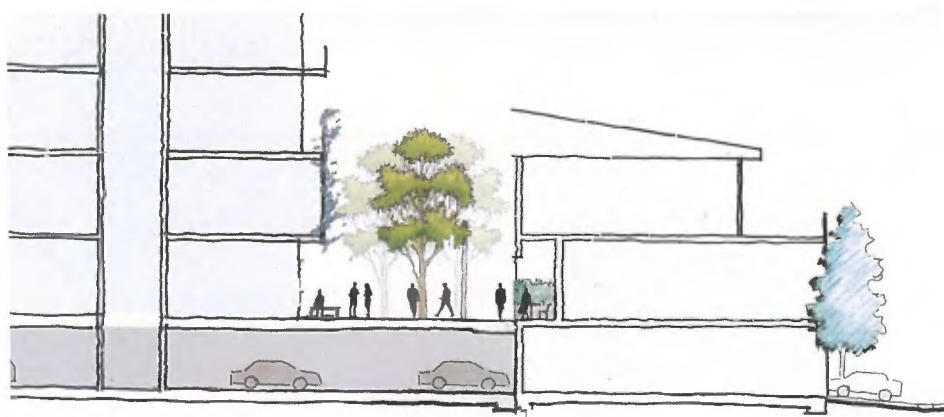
OUTER CIRCLE PAPER TRAIL - INDICATIVE SECTION B
